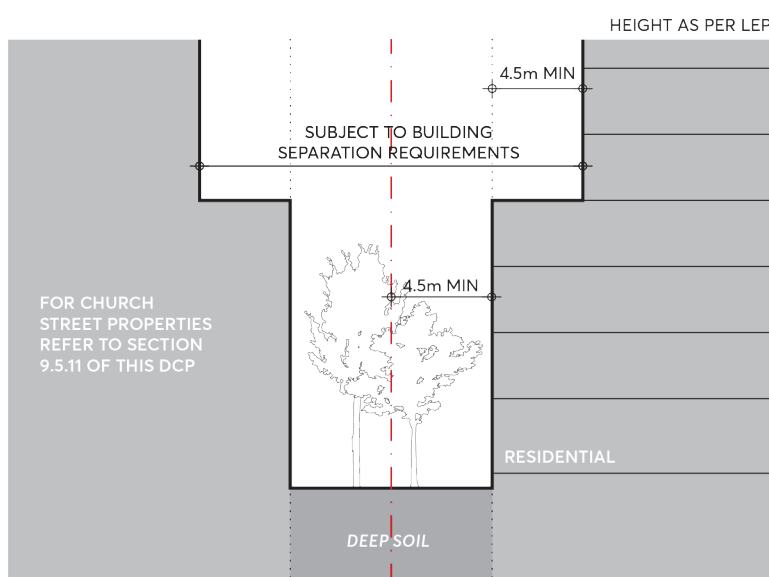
Setbacks and separation with properties fronting Church Street (site 07, site 08 and site 11)
